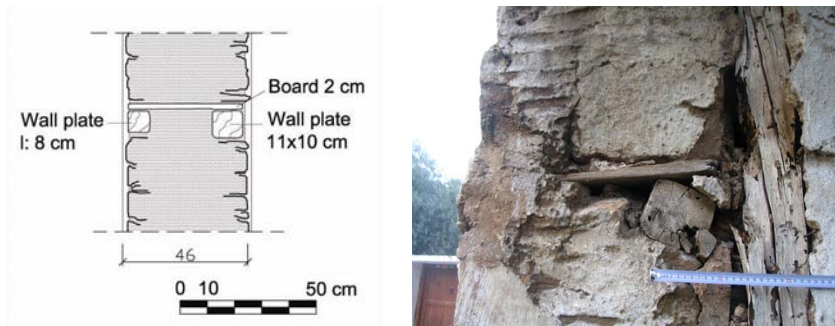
Connections of wall plates by the placement of board (Şahidi St. No: 26)
